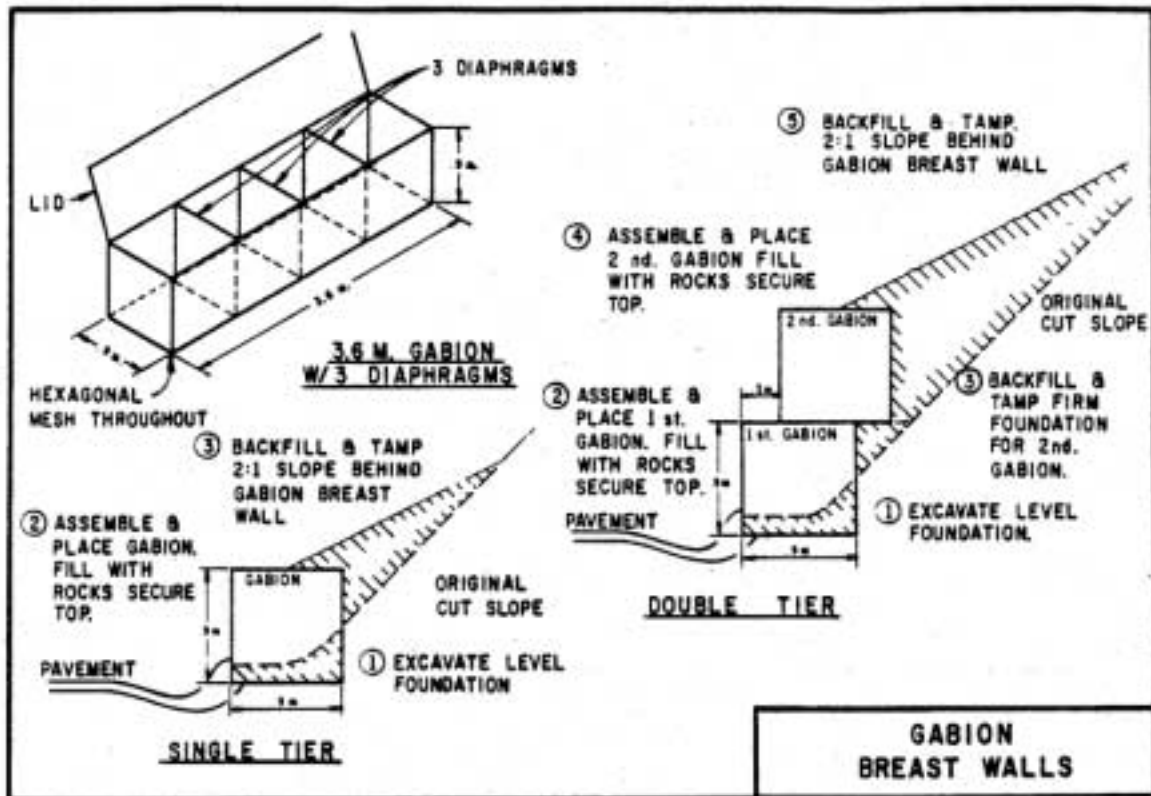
Low gabion breast walls showing sequence of excavation, assembly, and filling. (From White and Franks,1978)
